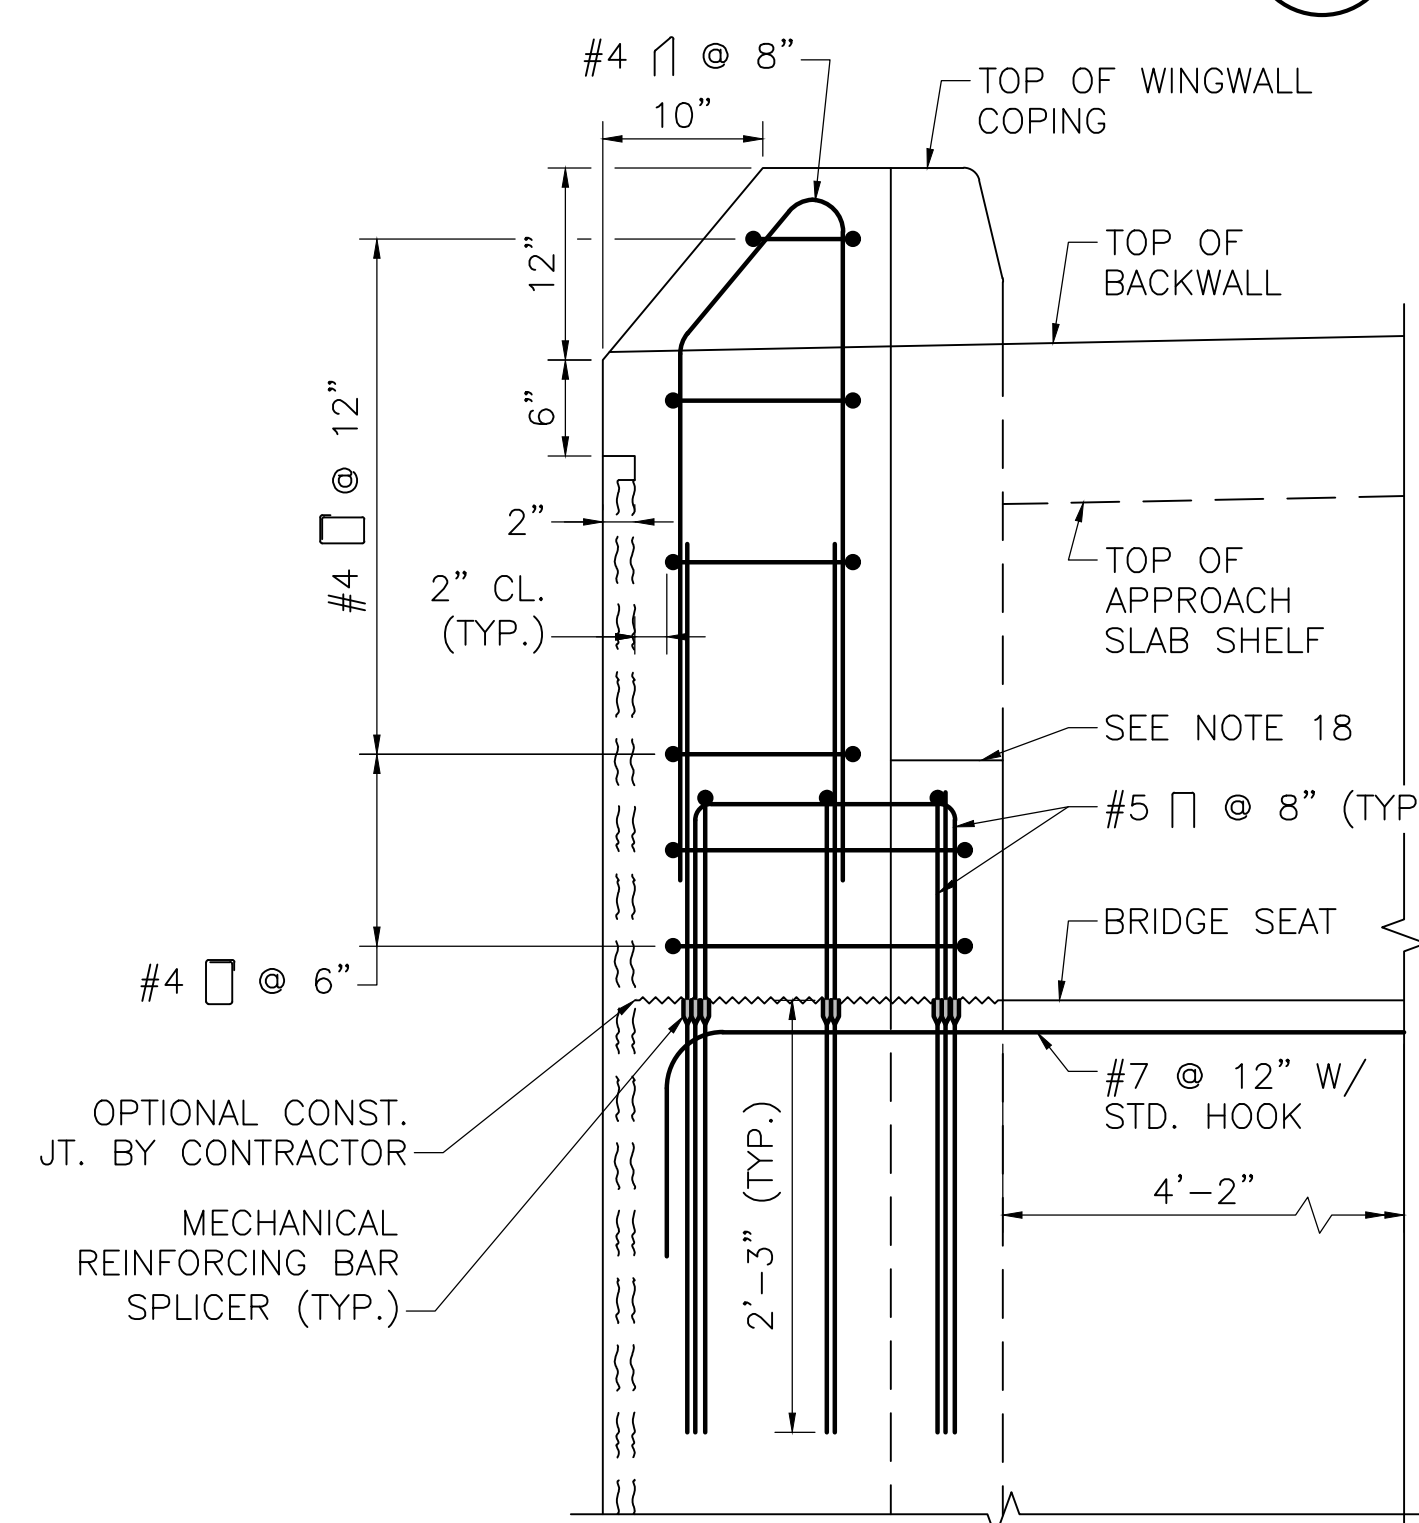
DETAILS AT ABUTMENT - ROADWAY SECTION
